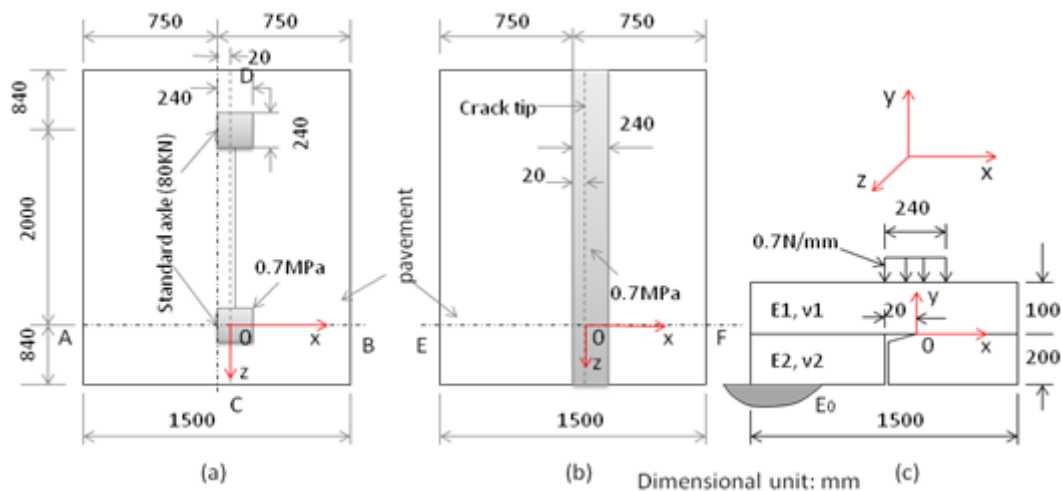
(a) Overlay pavement system subjected to standard 80kN - axle load; (b) a lane width pavement subjected to a pressure load through the width; (c) simplified model for loading mode (b)
